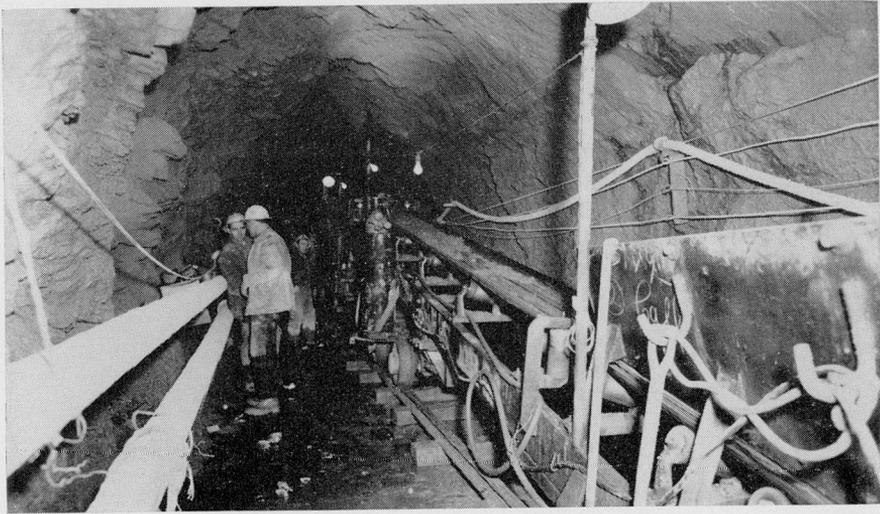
LOOKING SOUTHERLY, STA. 402 + 50, SHOWING CONCRETE CONVEYOR, CITY TUNNEL EXTENSION, SHAFT #8, CONTRACT 193, MARCH 28, 1956.
